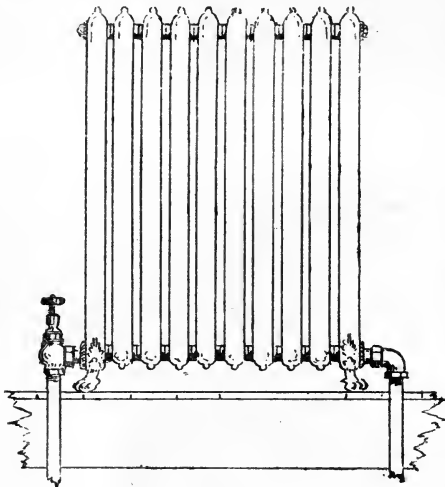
Best method of connecting a radiator without the connecting pipes being visible in the room.
